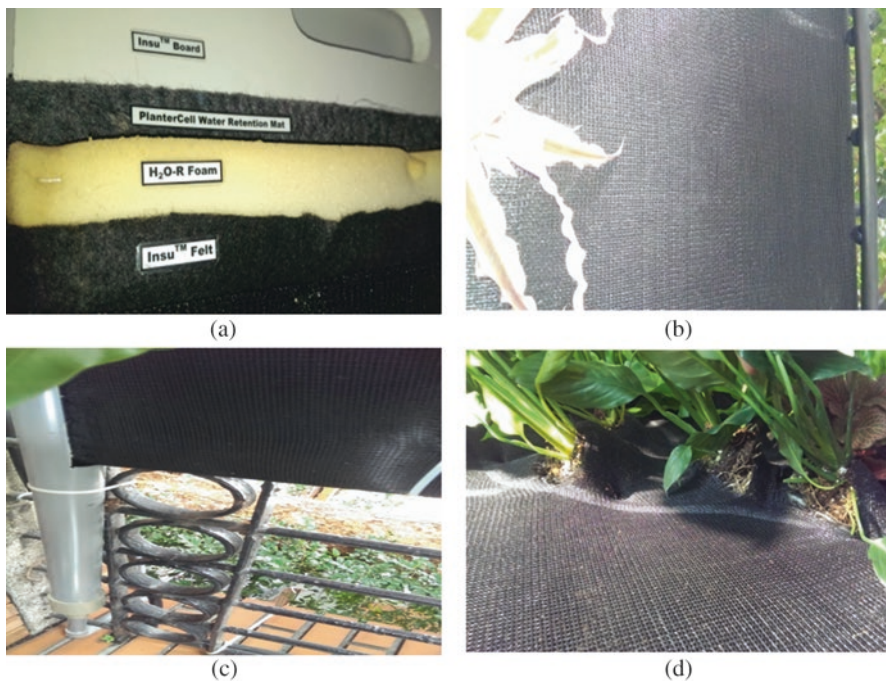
Four-layered substrate panel system adopted in a construction project in the City Branch of National Chengchi University. (a) Four foam-type substrate layers. (b) Water outlet above the substrate panel. (c) Water outlet and recirculation pipe at the bottom. (d) Four-layered substrate panel
